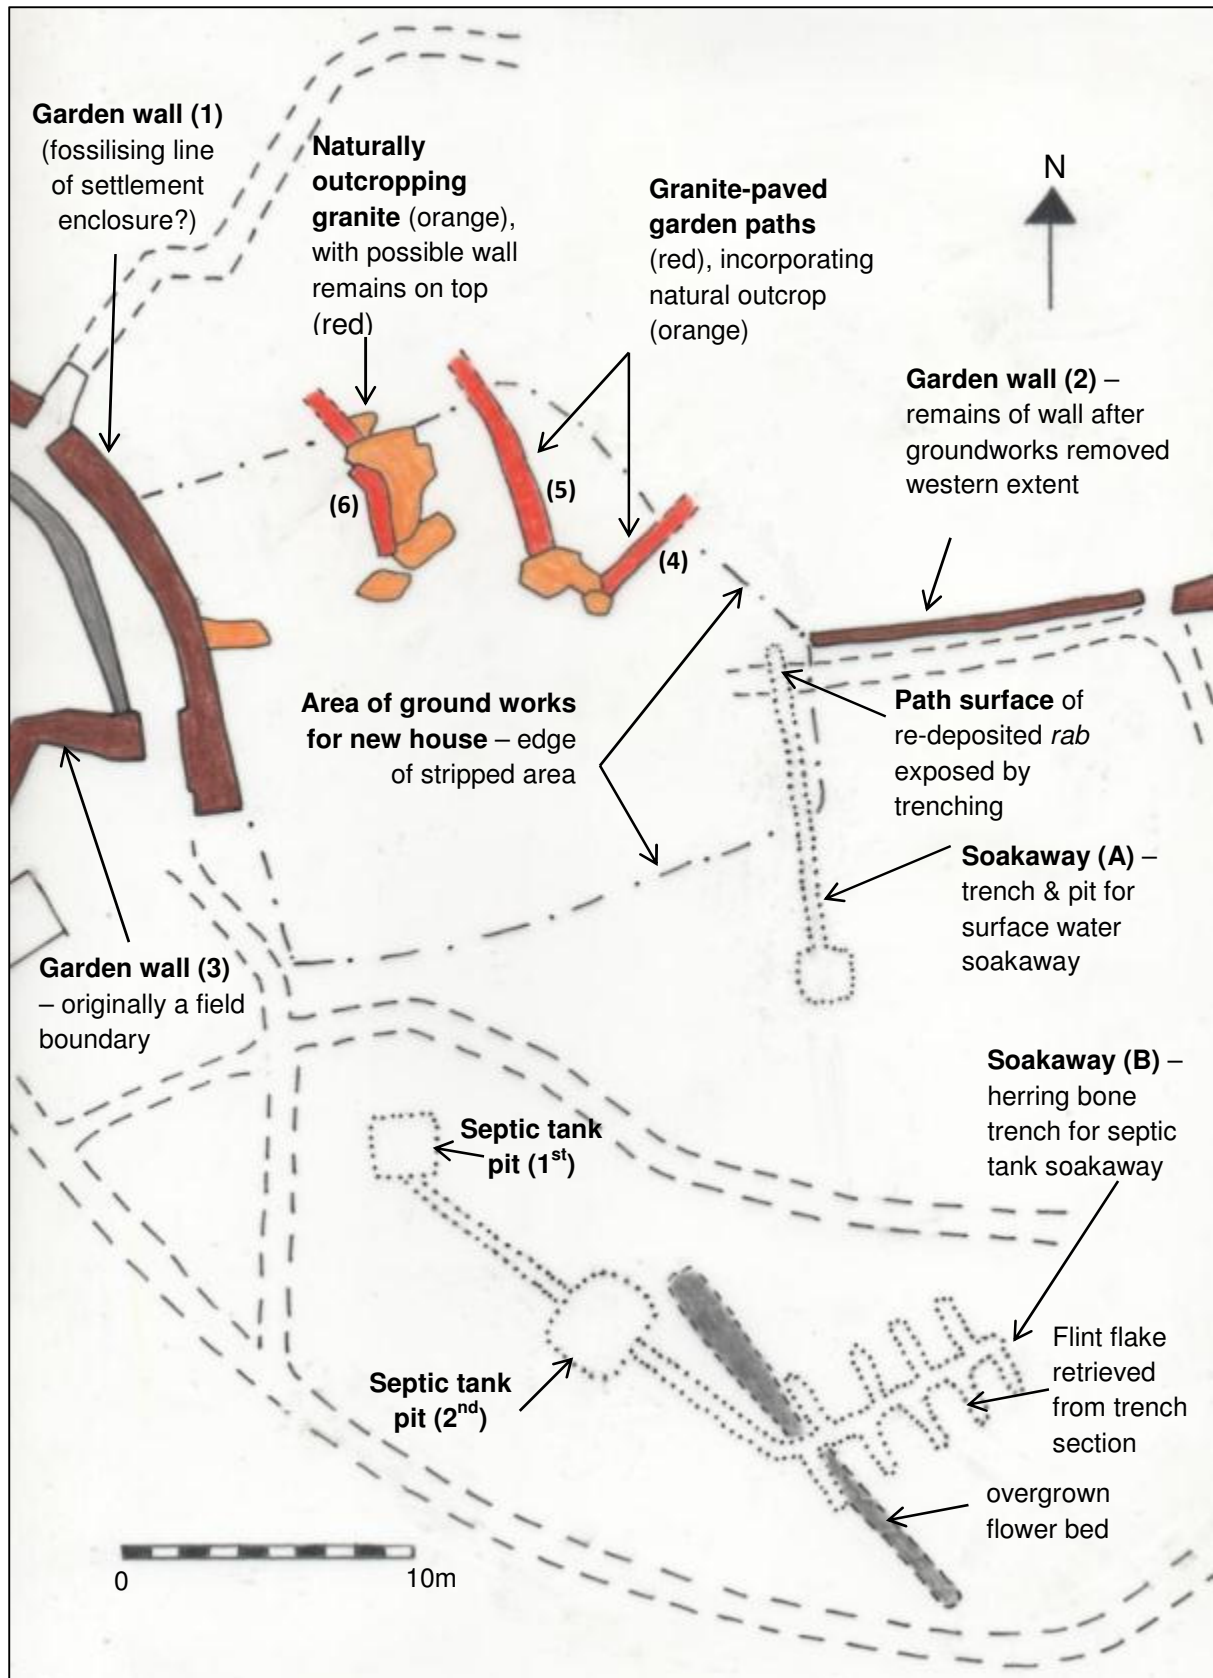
Plan of ground works and exposed historic and natural features (adapted from architect's plan)
